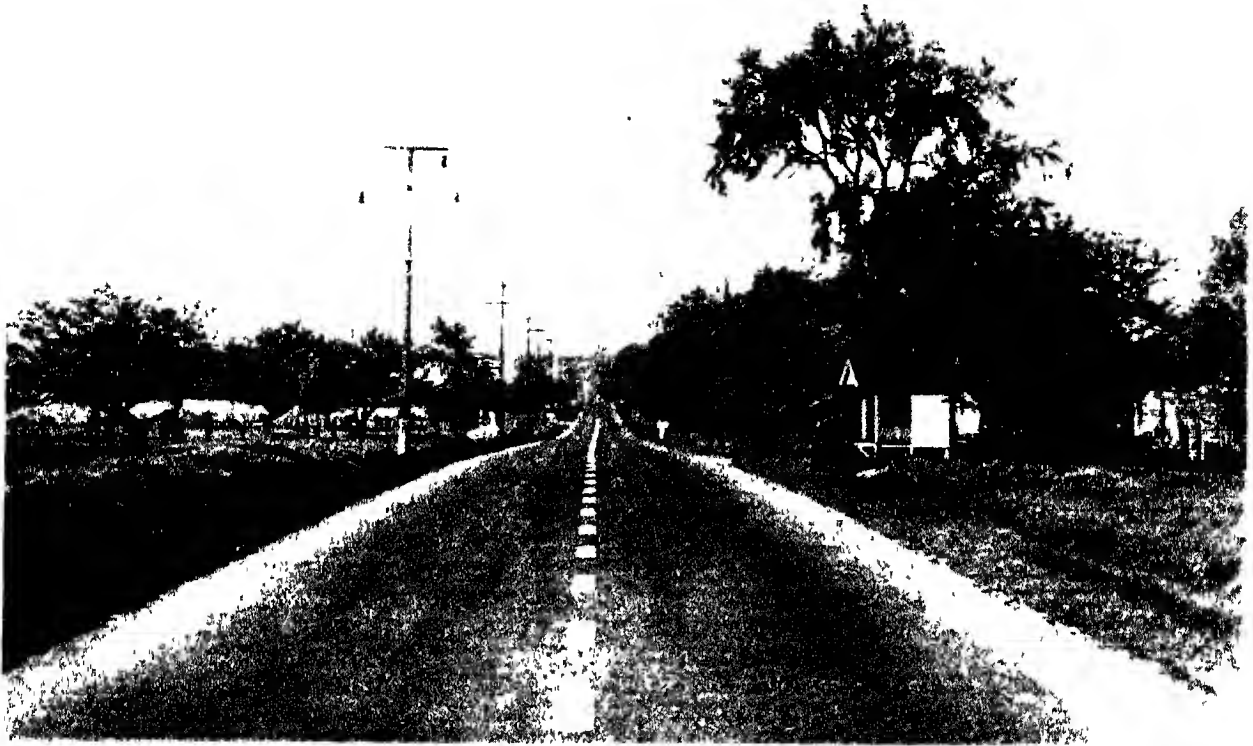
MIXED MACADAM PAVEMENT, THE KING'S HIGHWAY, ONTARIO, CANADA, 1930
